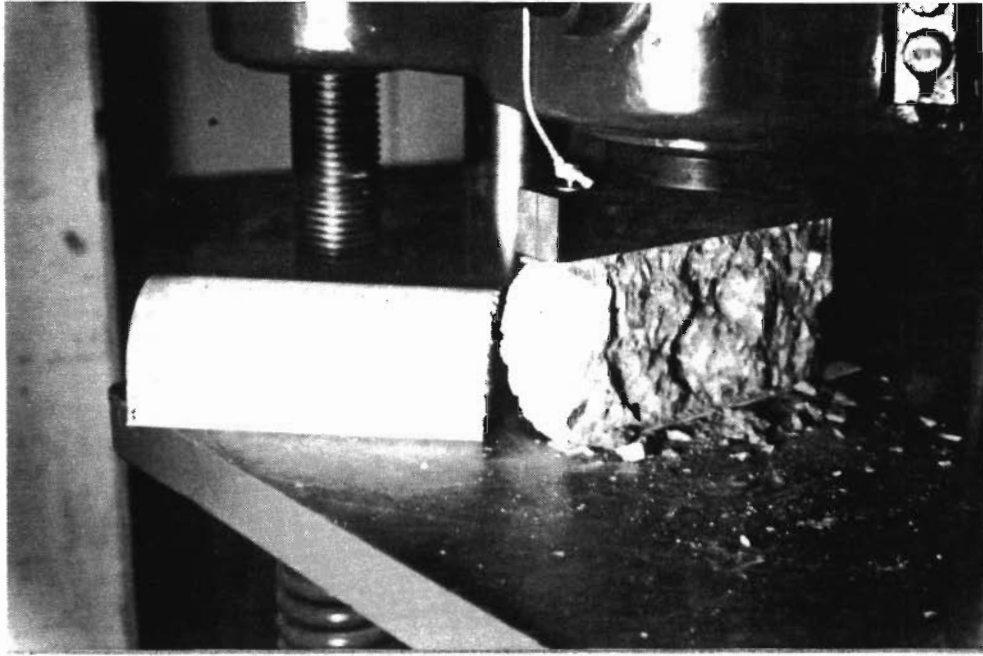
Typical fracture plane of a specimen tested as shown in the previous figure.
